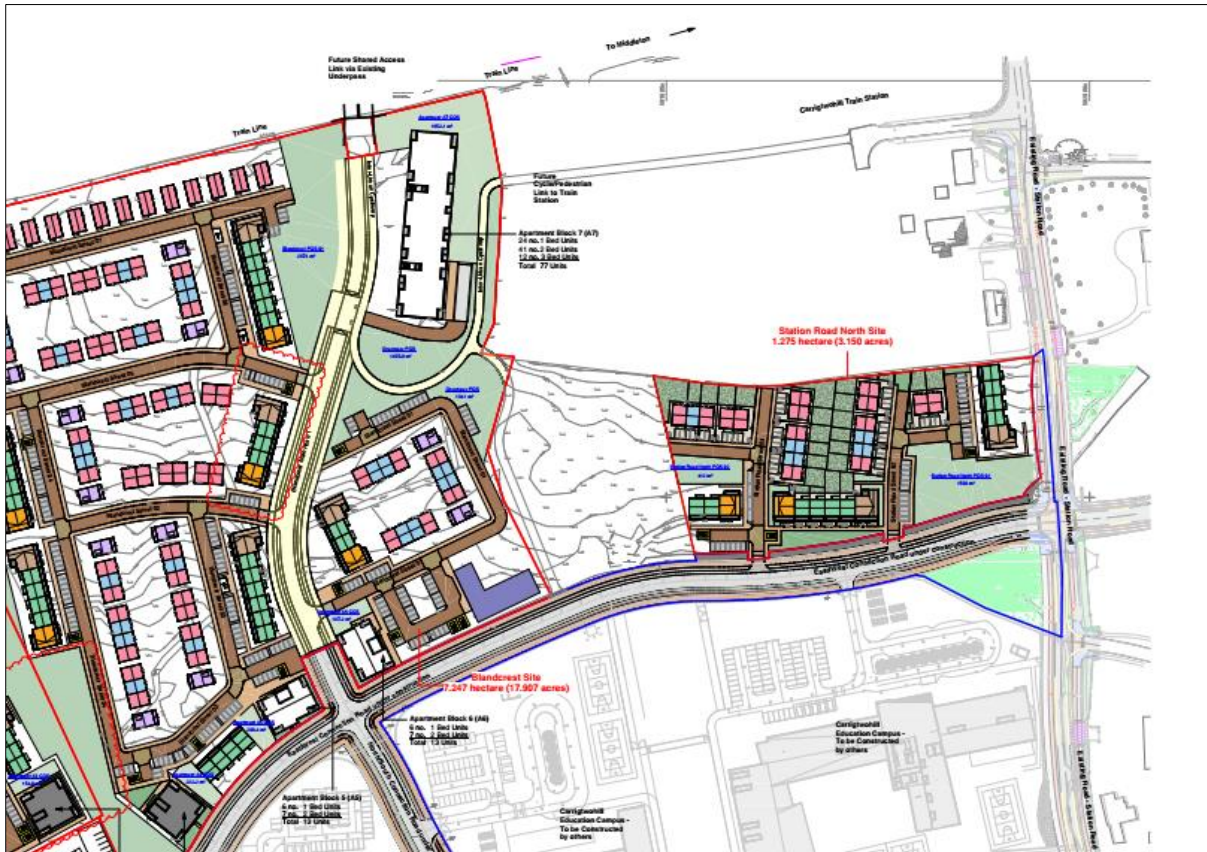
Image of part of the proposed residential development plan showing Blandcrest Main road 1 (pale yellow) and the two roads under construction that it will link up with (in grey)
